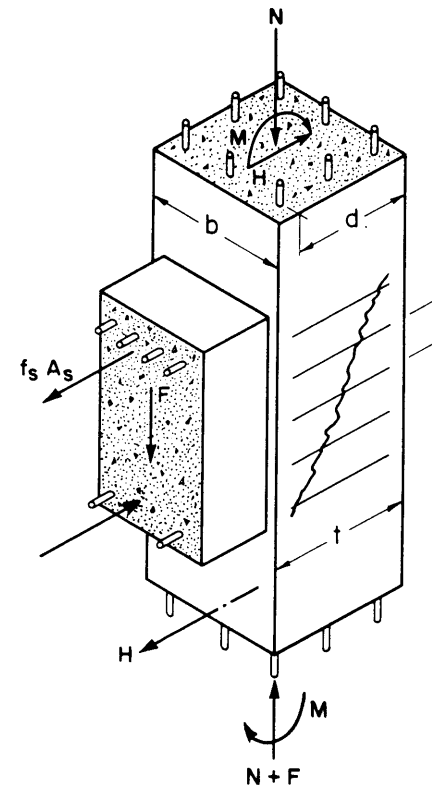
FORCES ON BEAM-COLUMN JOINT
